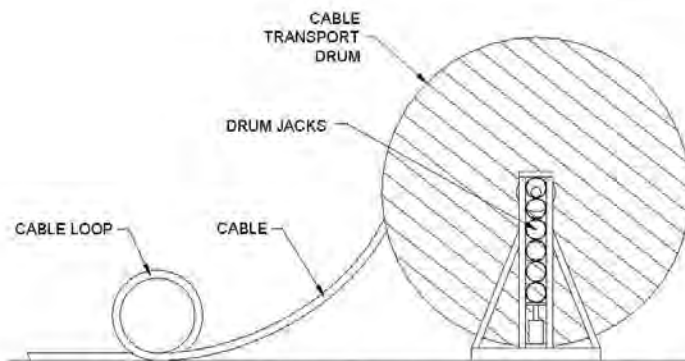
Removal of Cable Twist Using Cable Coil Method
